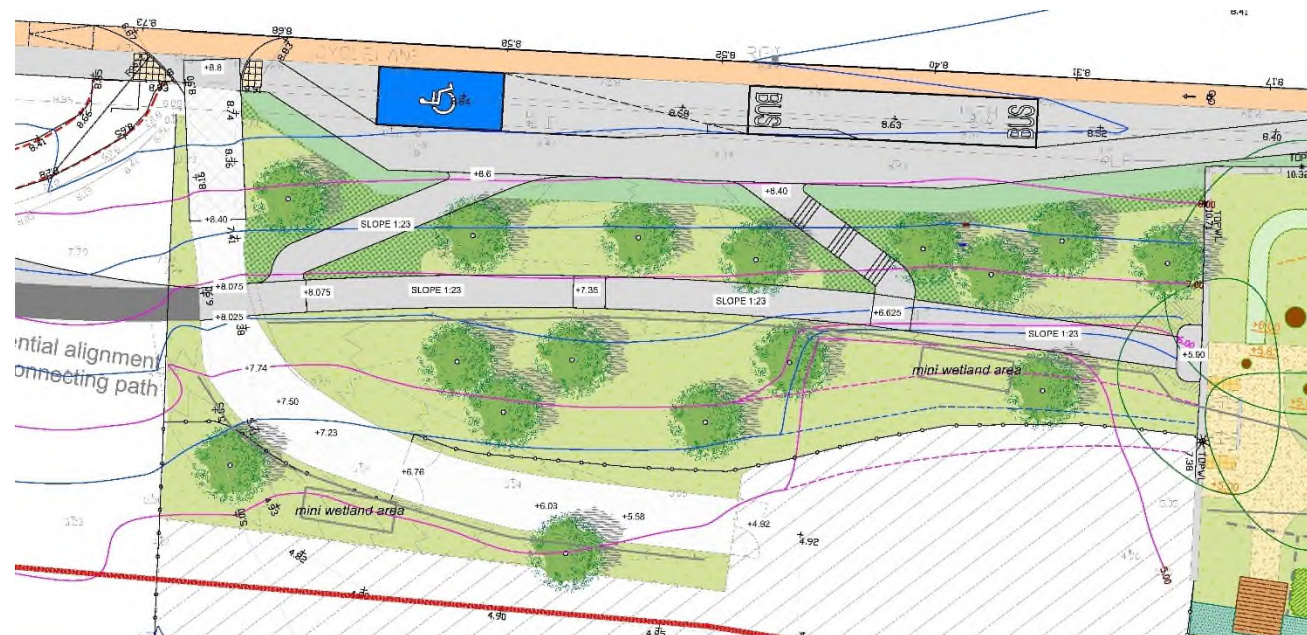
Proposed Drainage Layout at Department of Defence Lands showing proposed mini wetlands.
